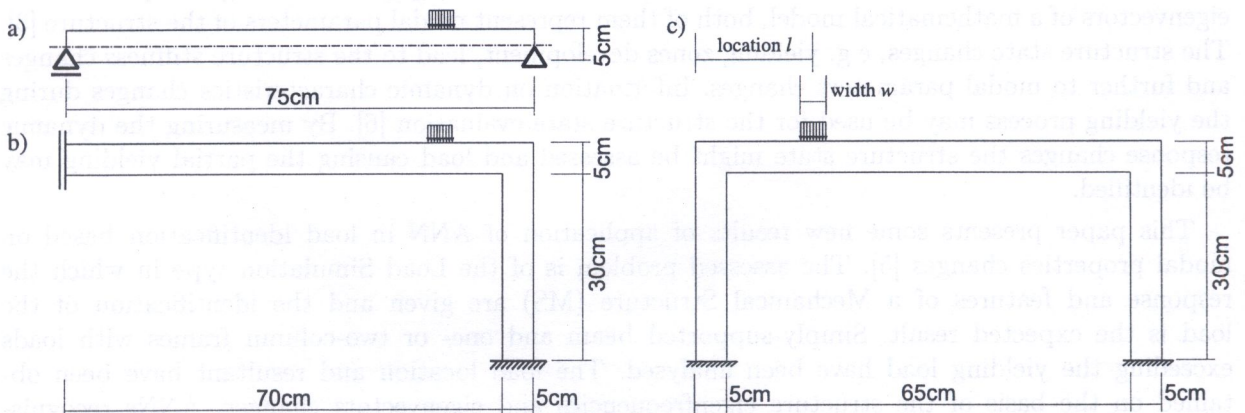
FE models of investigated structures: a) beam, b) one-column frame, c) two-column, portal frame
